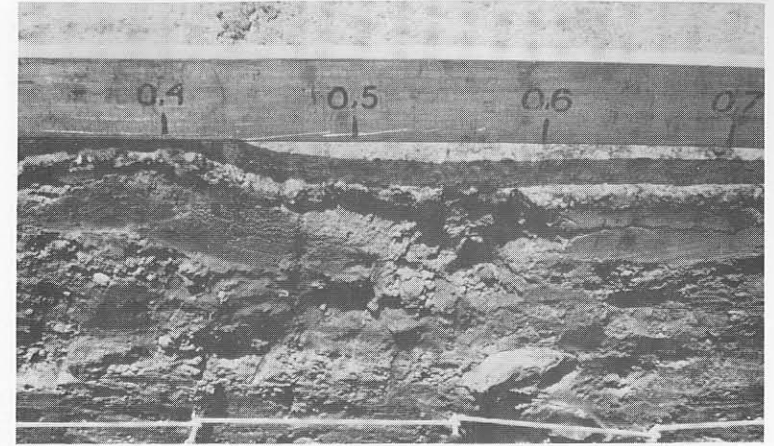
HORIZONTAL CRACKING IN THE CEMENTED BASE OF THE RELATIVELY DEEP PAVEMENT, PRIOR TO HVS TESTING ON ROAD 1932 AT ROOIWAL.
